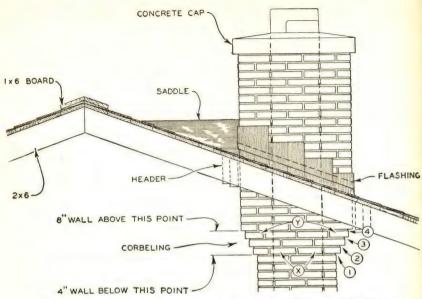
Exposed Upper Section of Chimney Built with Eight-Inch Walls to
